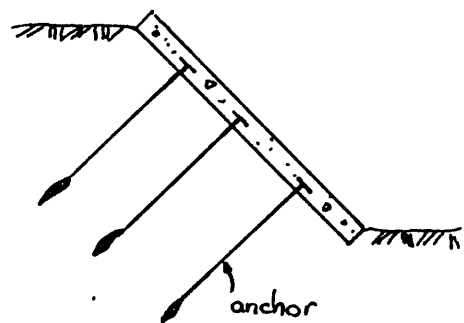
RESTRAINING SIDE OF SLOPE IN A ROAD CUTTING OR OTHER EXCAVATIONS.
